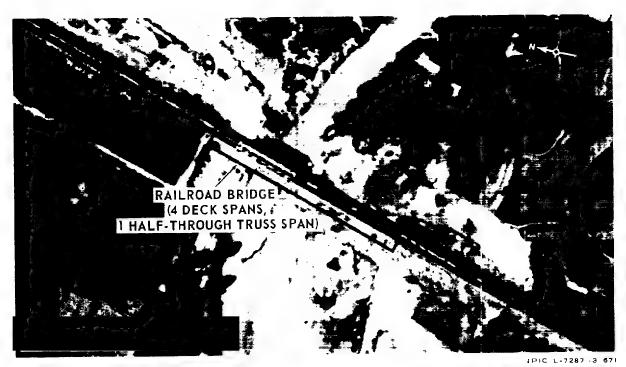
RAILROAD BRIDGE, PHNOM PENH KAMPOT RAIL LINE, CAMBOLIA
